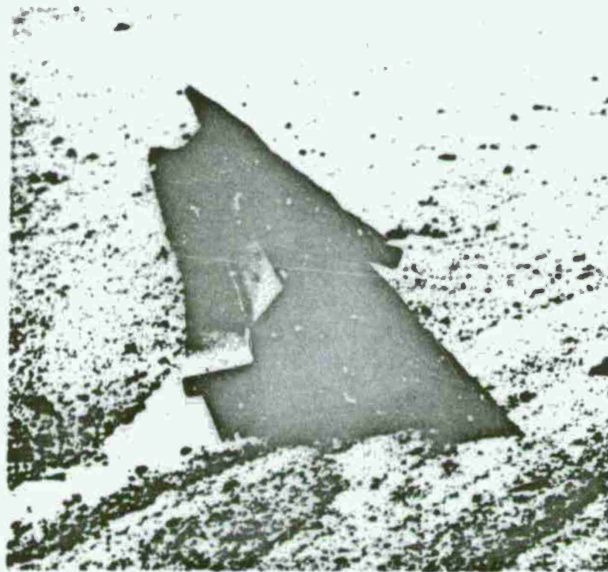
Twisted I-Beam Recovered From Igloo E. This beam was bolted to door frame to provide additional restraint to door.
